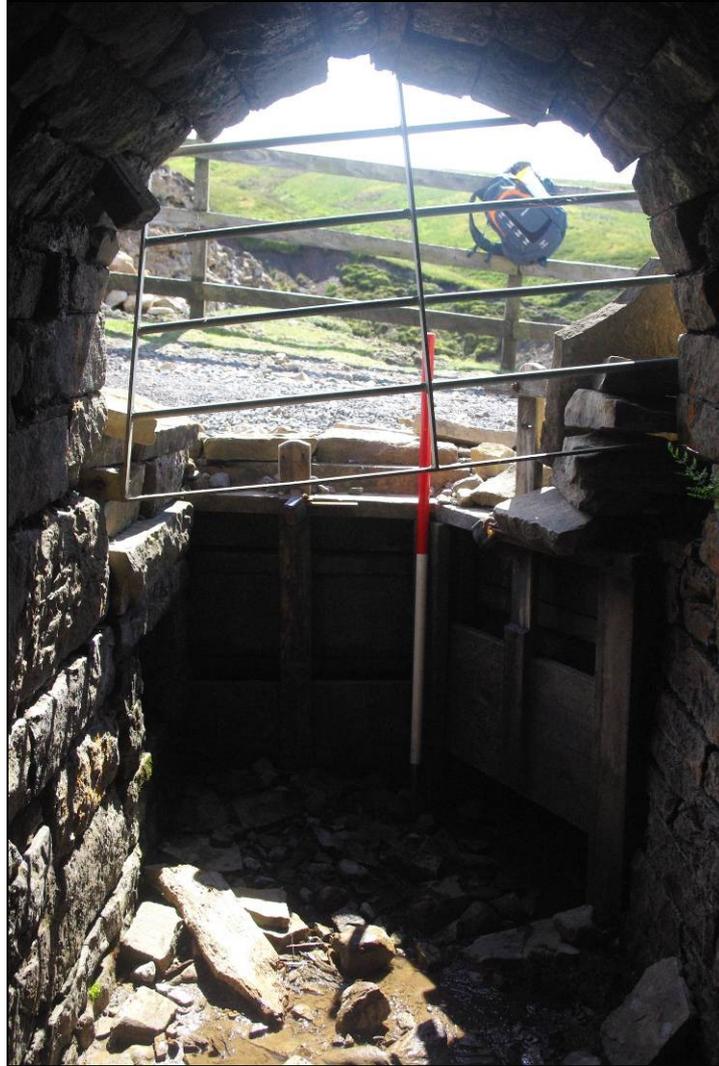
Junction from tailrace culvert (2577) to launder for smelt mill complex.
